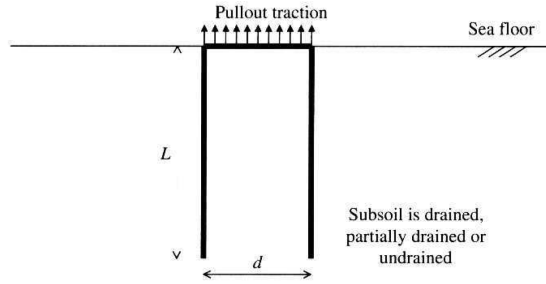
Suction caisson foundation under vertical uplift loading (Adopted from [28]).
